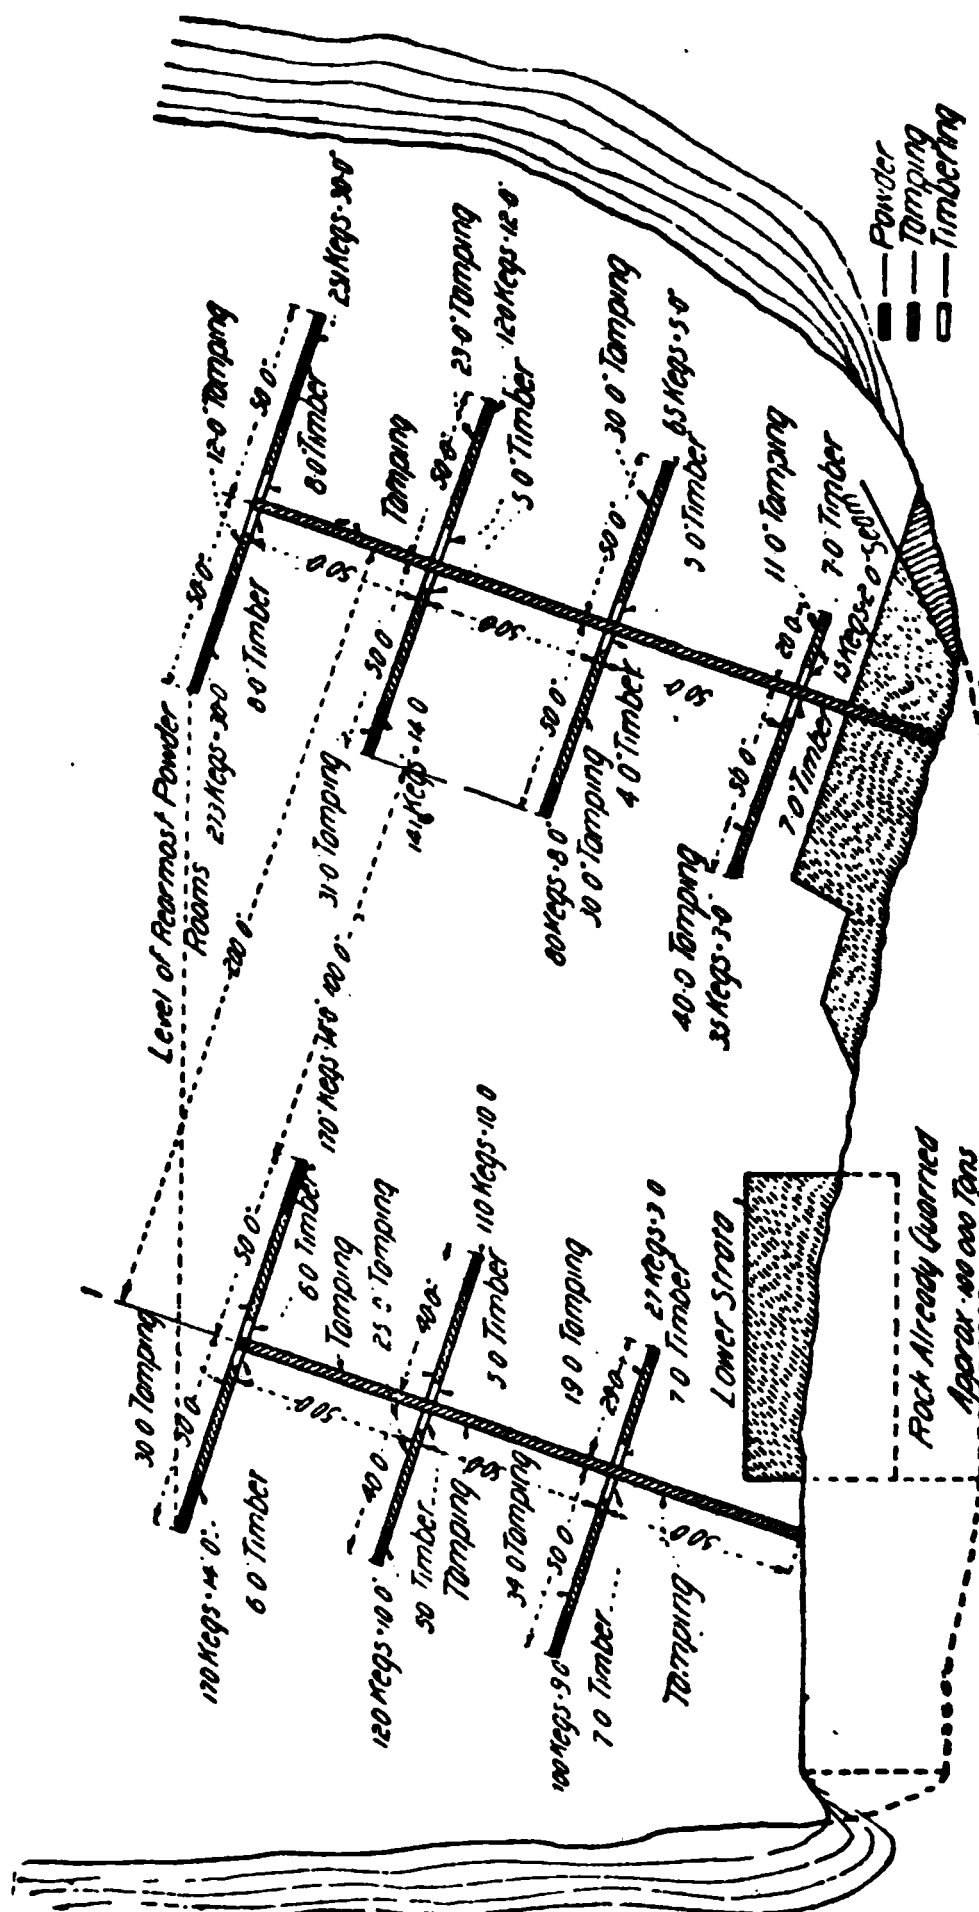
Plan of Tunnels and Loading for Quarry Blast.
